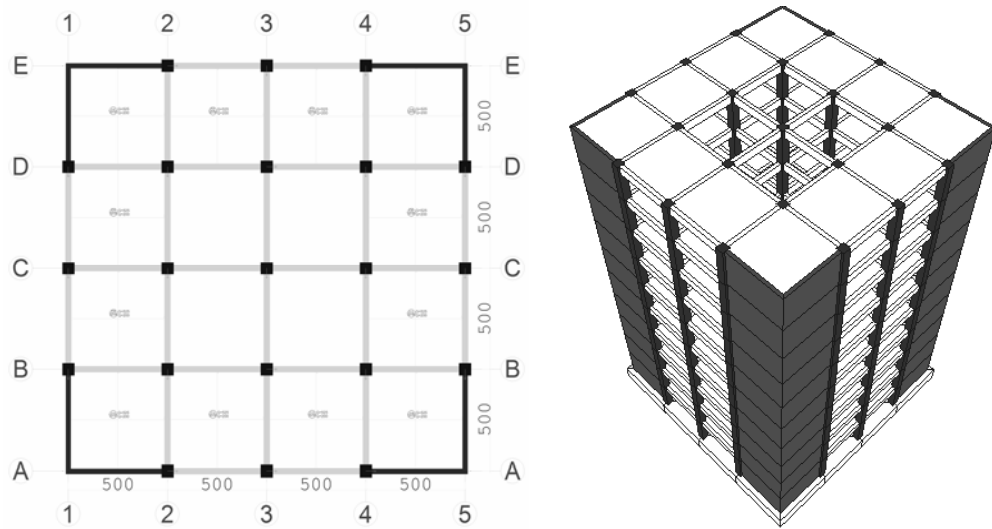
Structural plan and 3D view of parametric model IIIf
